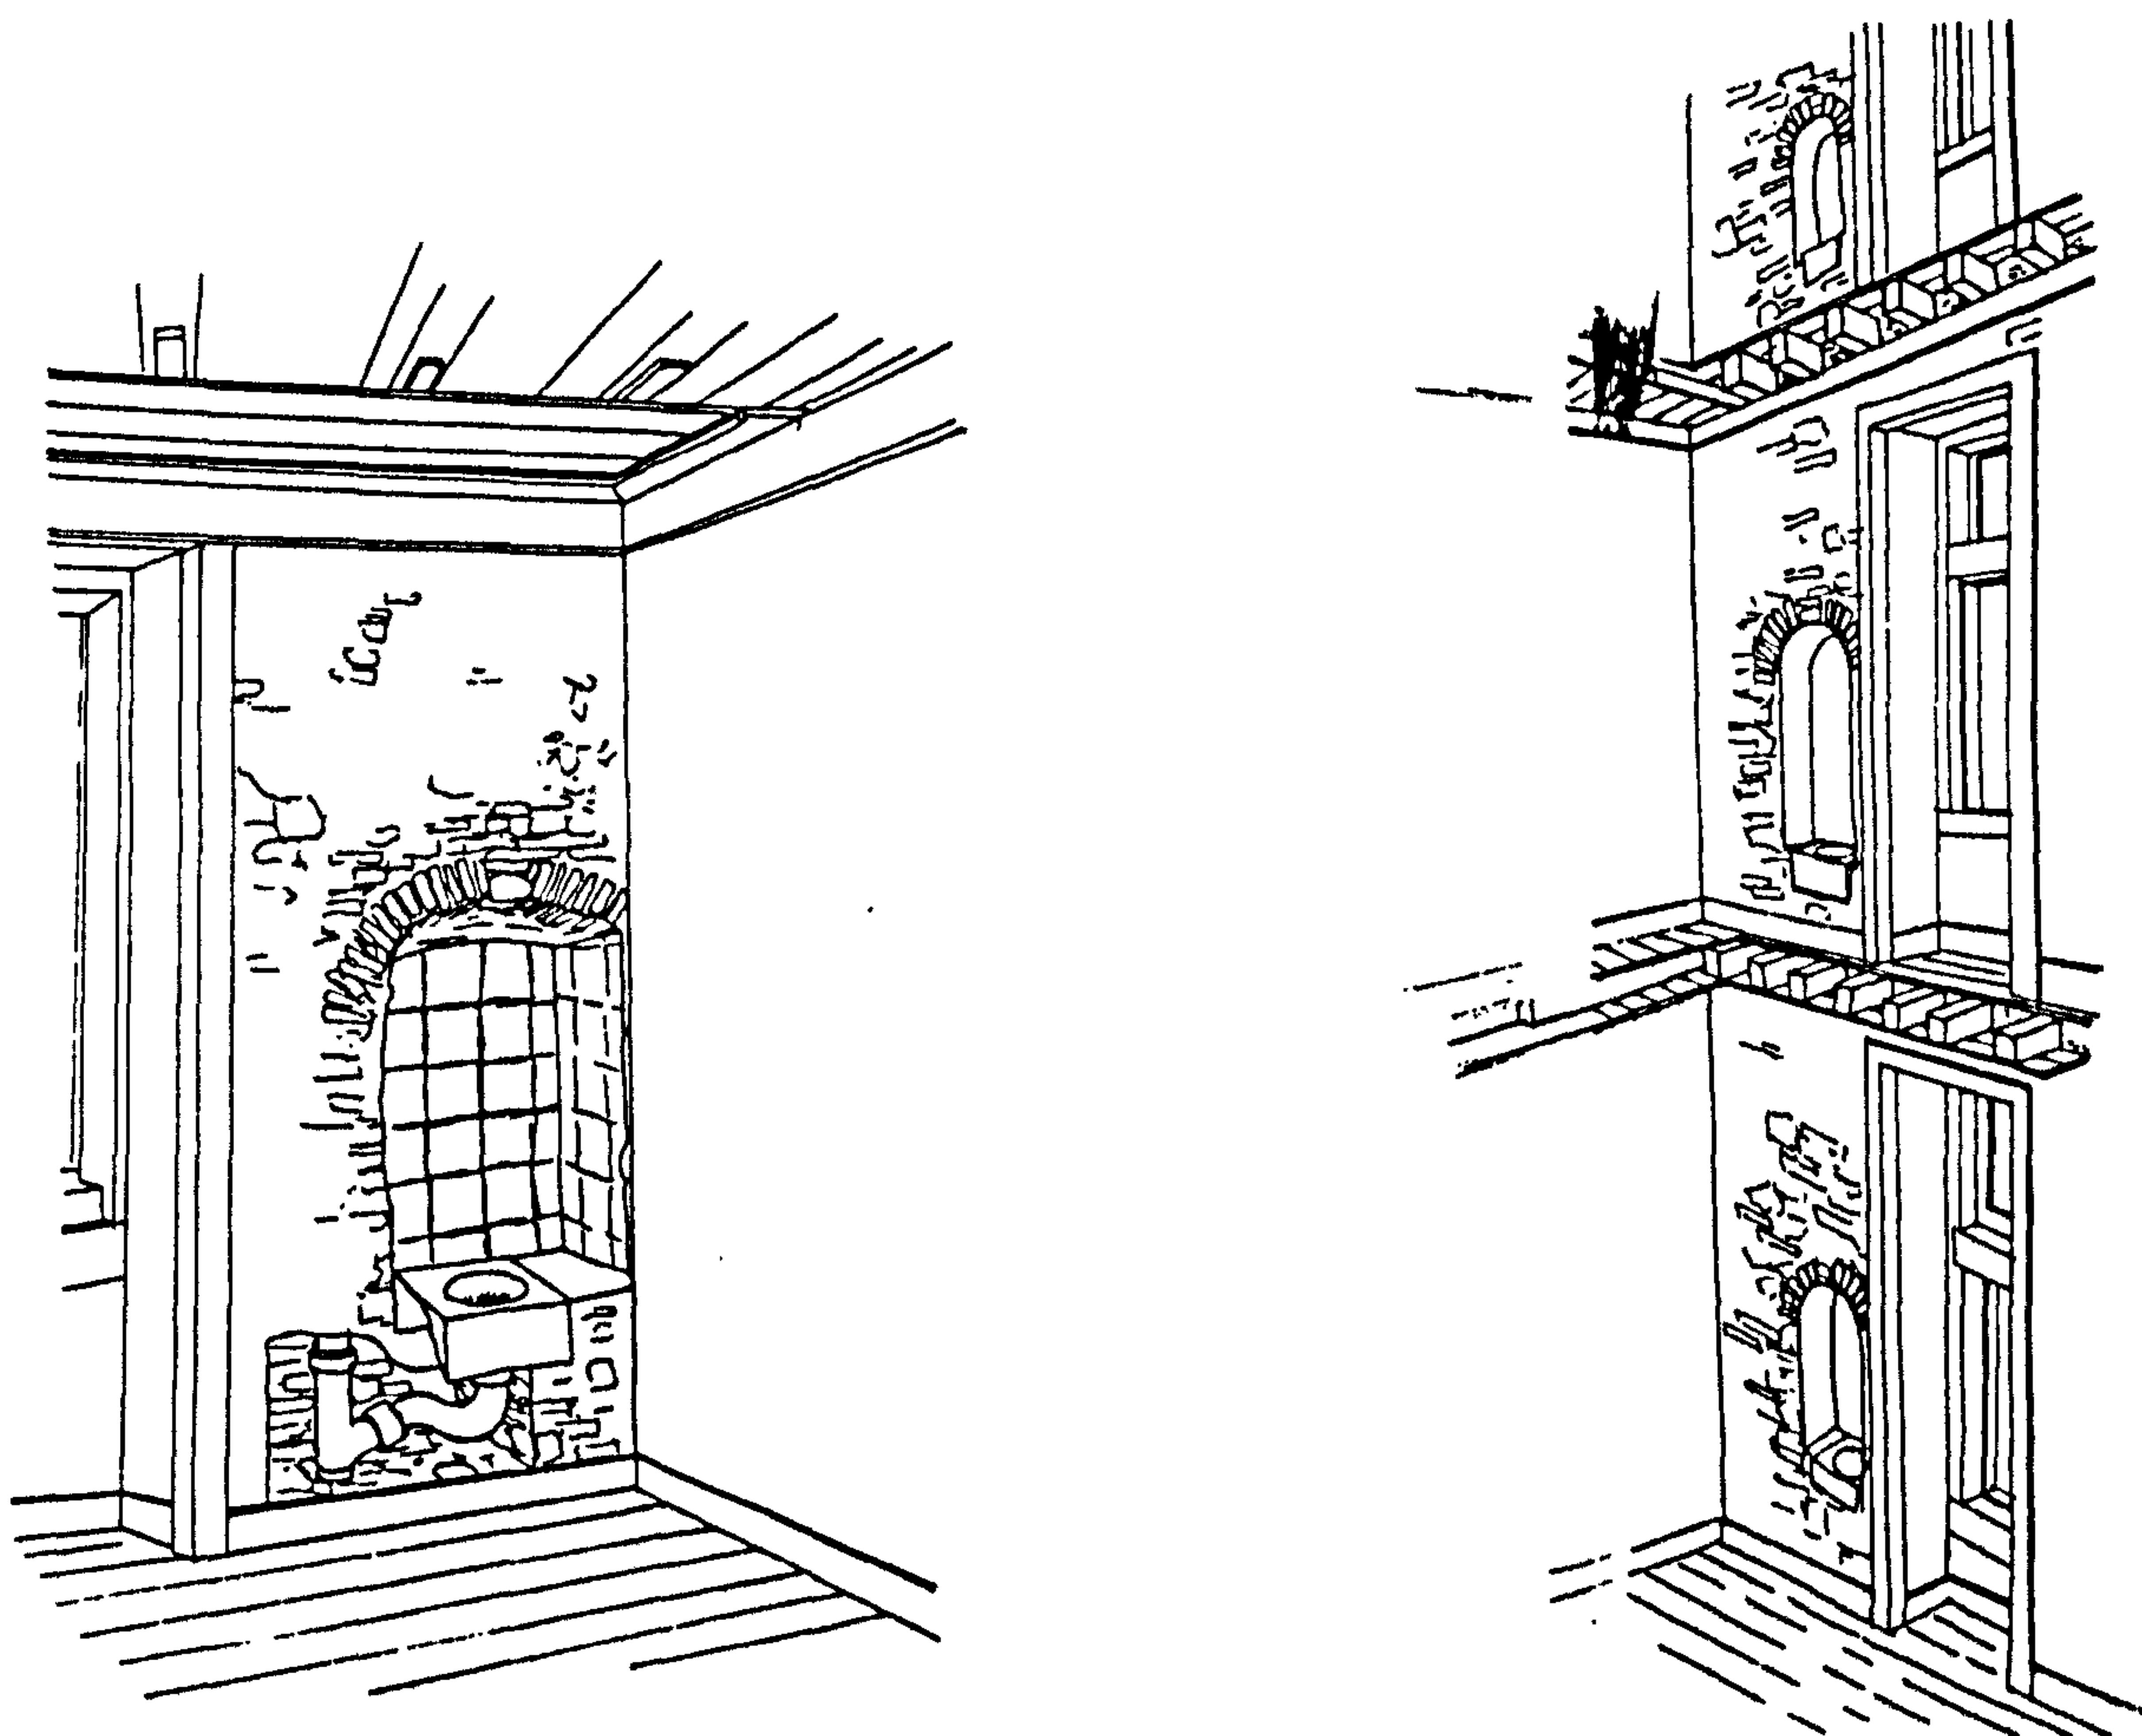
and 3.132-Details of the construction of a drainage system (building C)
